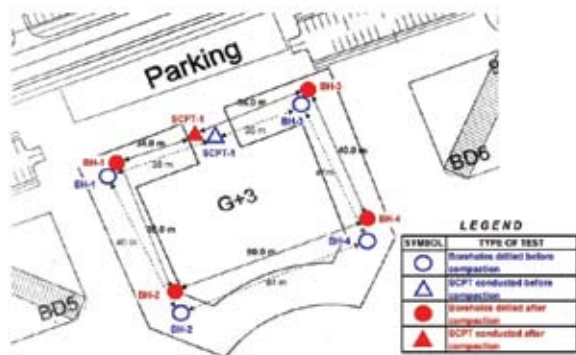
Layout Plan – Boys Hostel No. 8.1K
